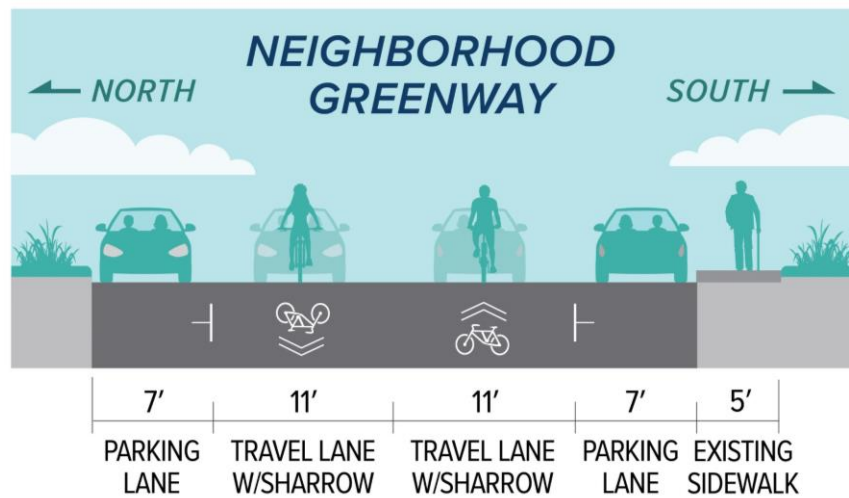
FRANKLIN AVENUE ALTERNATIVE A1/A2 – EMERSON AVENUE CROSS SECTION
